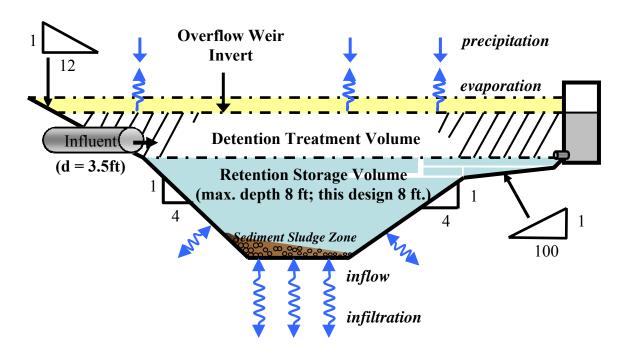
G.1-1 Longitudinal Section of SWFWMD Pond. (NOT TO SCALE)
